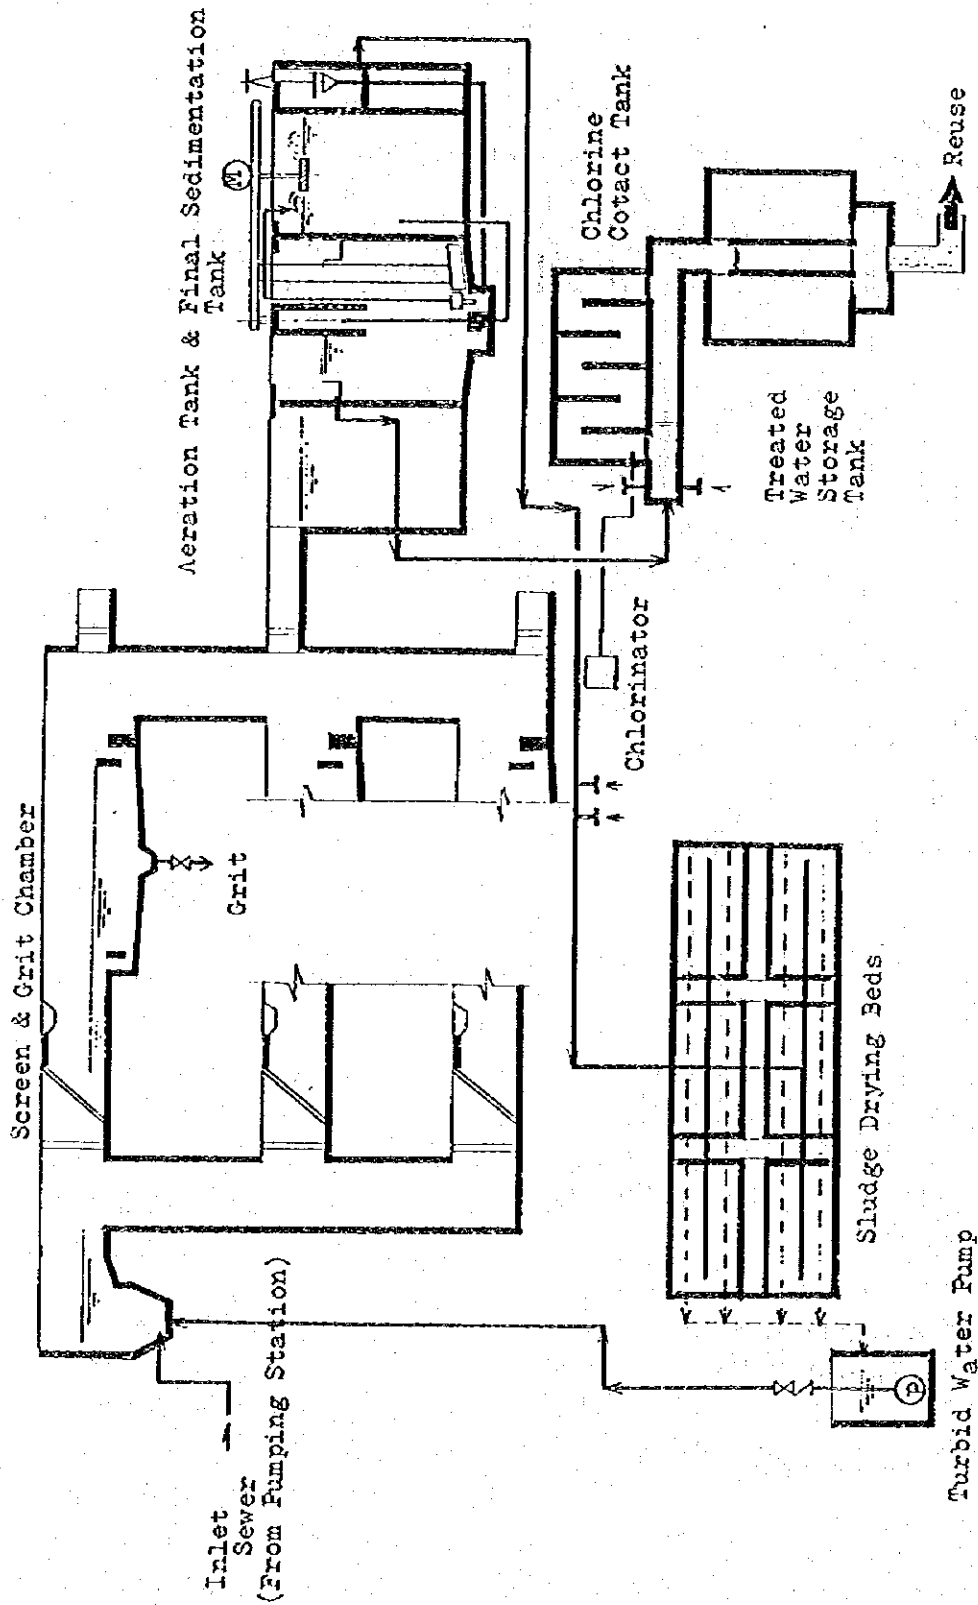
Flowsheet of Masaid Sewage Treatment Plant
